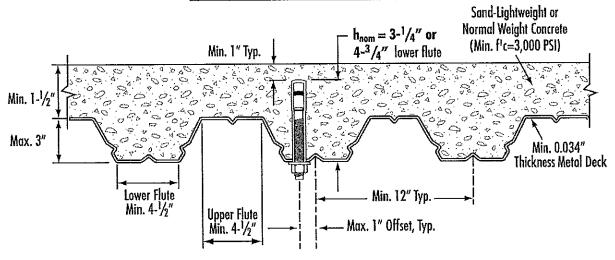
ITW RED HEAD CARBON STEEL TRUBOLT+ WEDGE ANCHOR AND OVERHEAD' TRUBOLT+ WEDGE ANCHOR LOCATED IN THE SOFFIT OF CONCRETE OVER STEEL DECK FLOOR AND ROOF ASSEMBLIES (1 inch = 25.4 mm)
